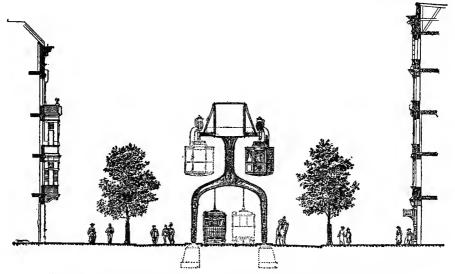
Cross section of street for heavy traffic Showing two Street Car Lines and Suspended Elevated Railroad System
